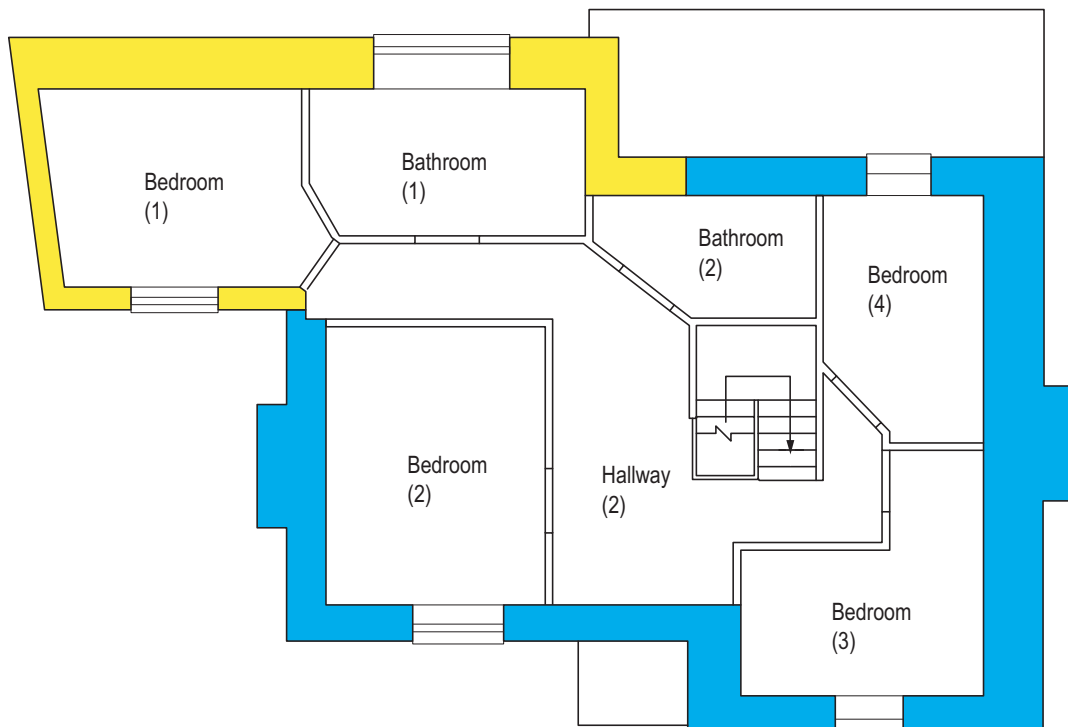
Cable Cottage, Salcombe; first floor plan.
